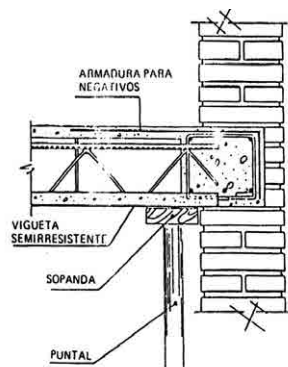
Reinforced concrete half-joists on 1 bat masonry brickwork loadbearing wall. In NTE (Normas Tecnológicas de la Edificación).
